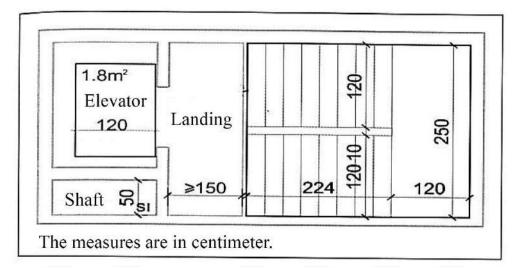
Minimum dimensions for a staircase and elevator shaft (Armağan, 2018).
